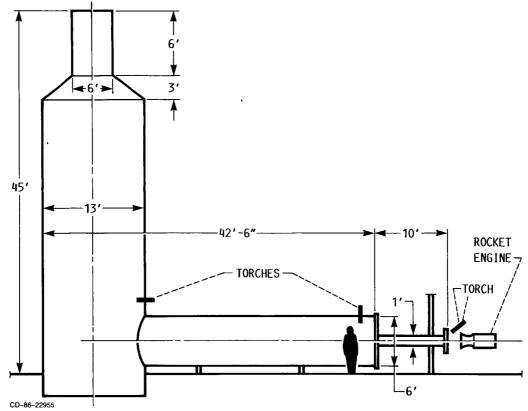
ROCKET COMBUSTION LABORATORY SCRUBBER EXHAUST DUCT.
